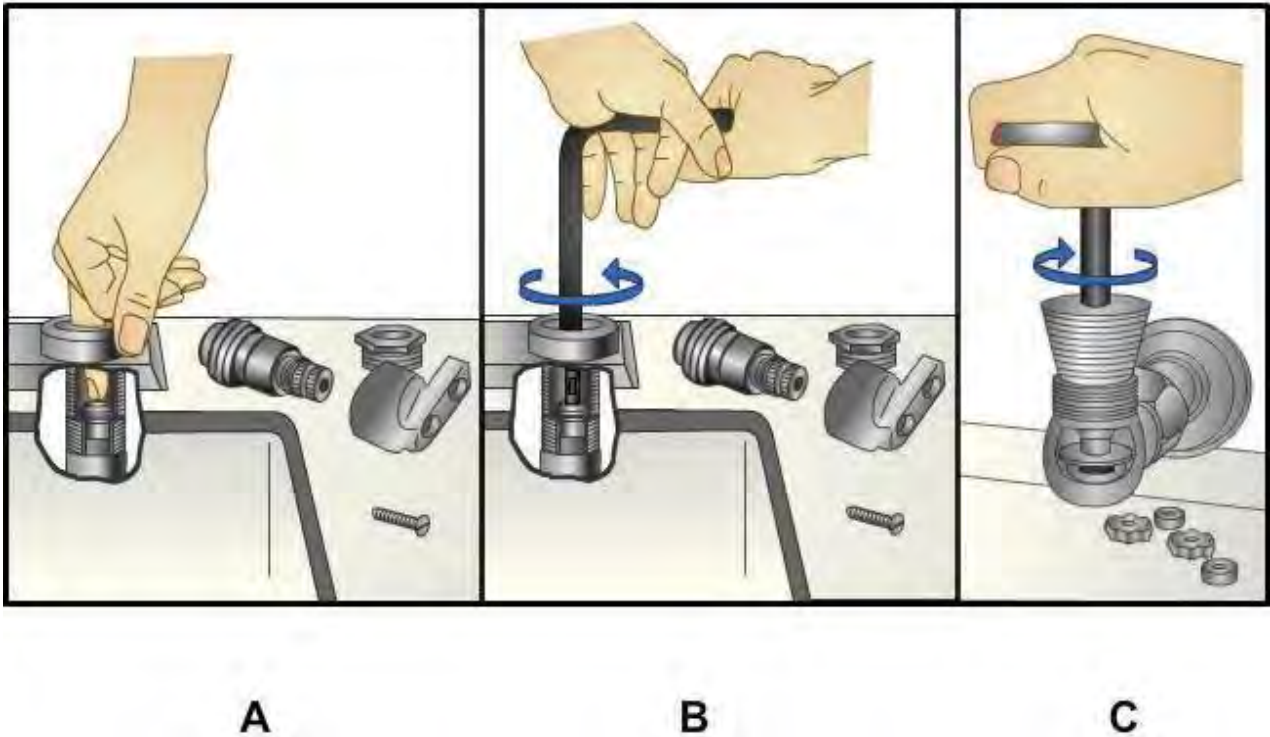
Inspecting, removing, and refacing faucet seats.
